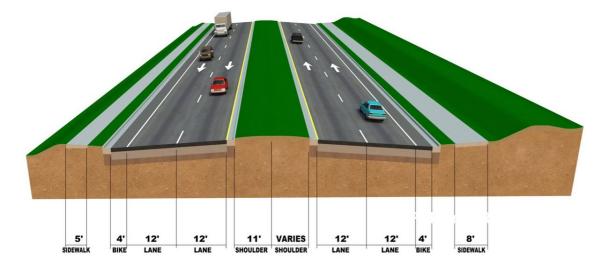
East Lake Mary Boulevard Existing Typical Section
